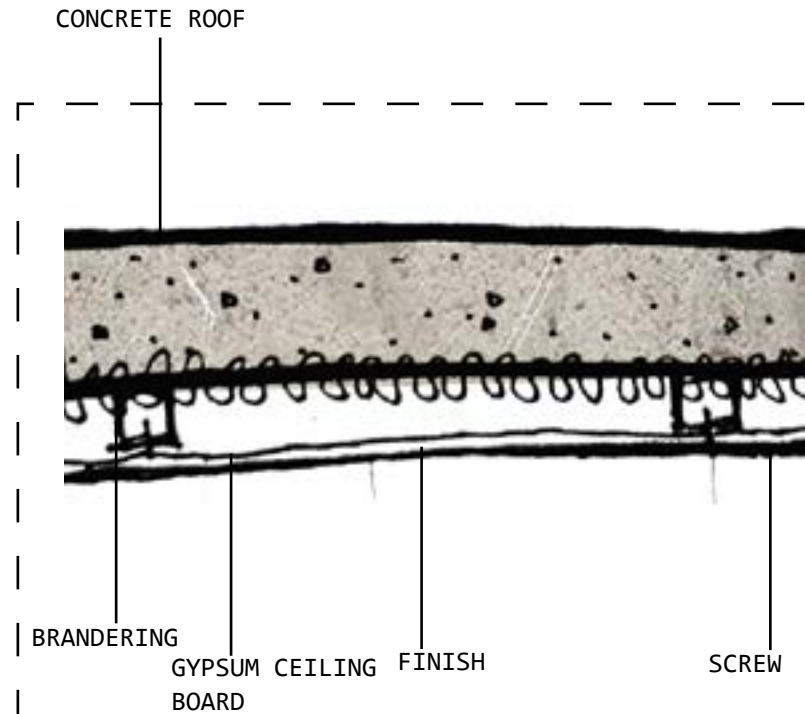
M: [DETAIL 6] Conventional ceiling board (Author, 2021)
